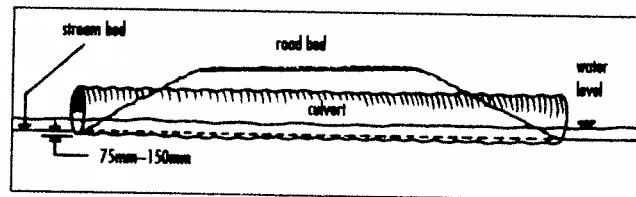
Install Culvert 75 mm to 150 mm below the stream bed.
